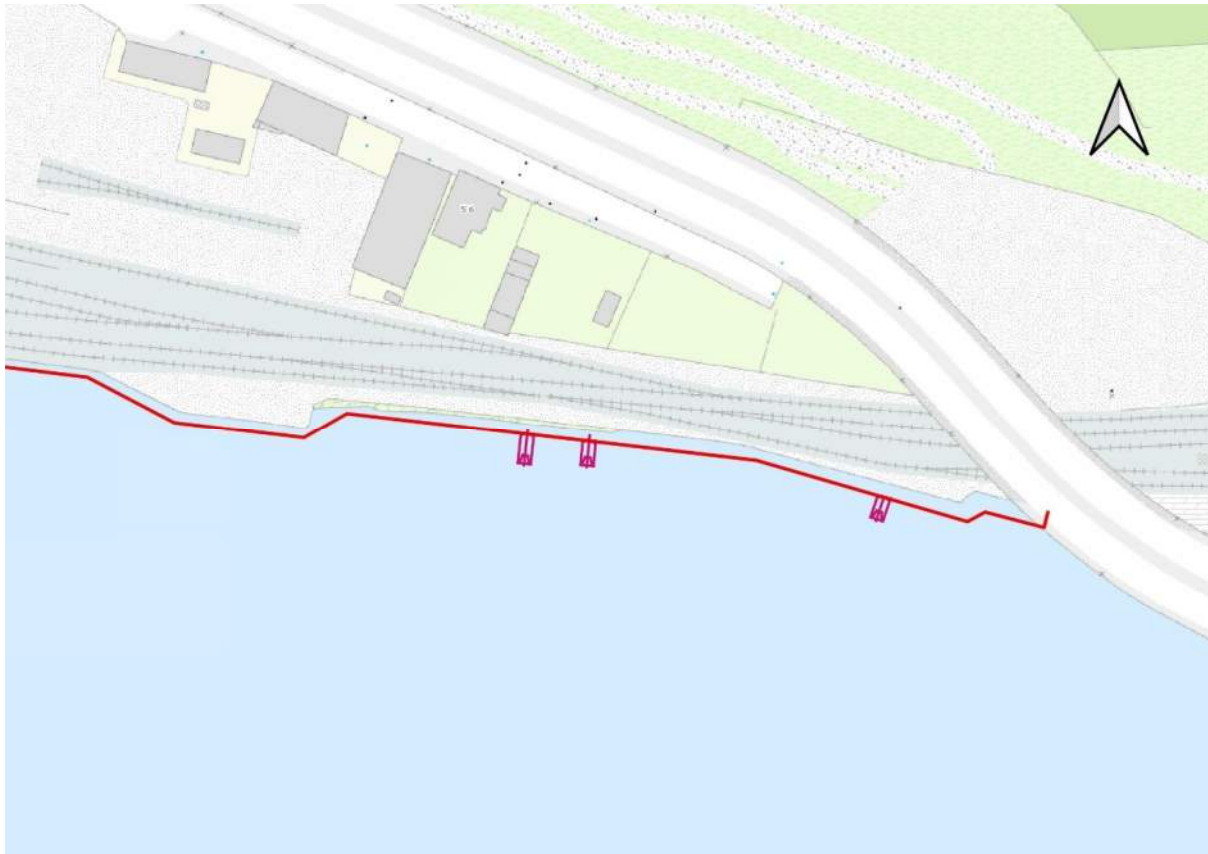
Location of storm drainage outfalls associated with the proposed Flood Defence Wall at the North Quays area
